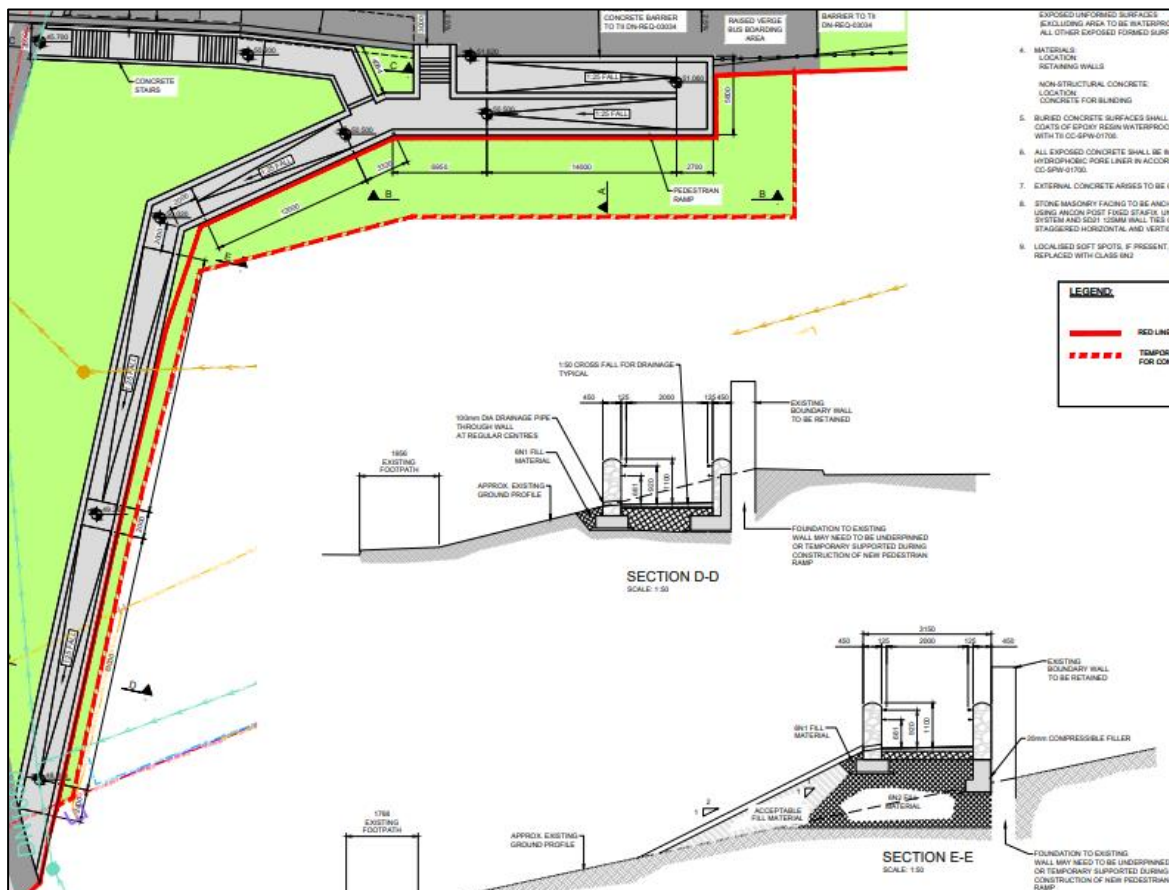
Extract from RW-07A Stairs and Access Ramp (Bridges and Major Retaining Structures drawings from Volume 3 of the EIAR)
